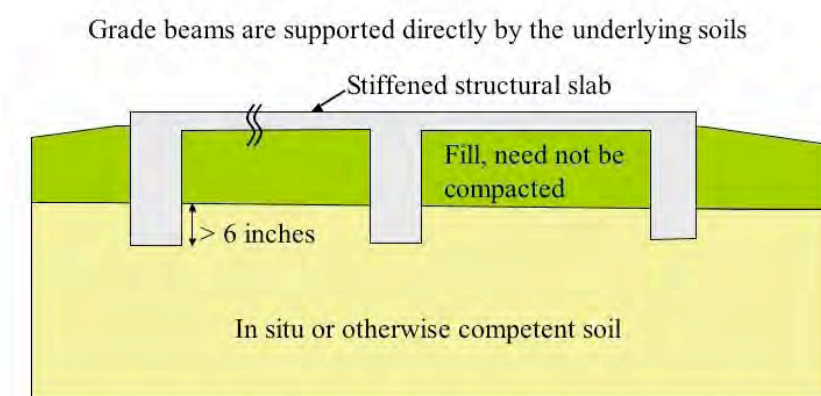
Grade-Supported Stiffened Structural Slab
